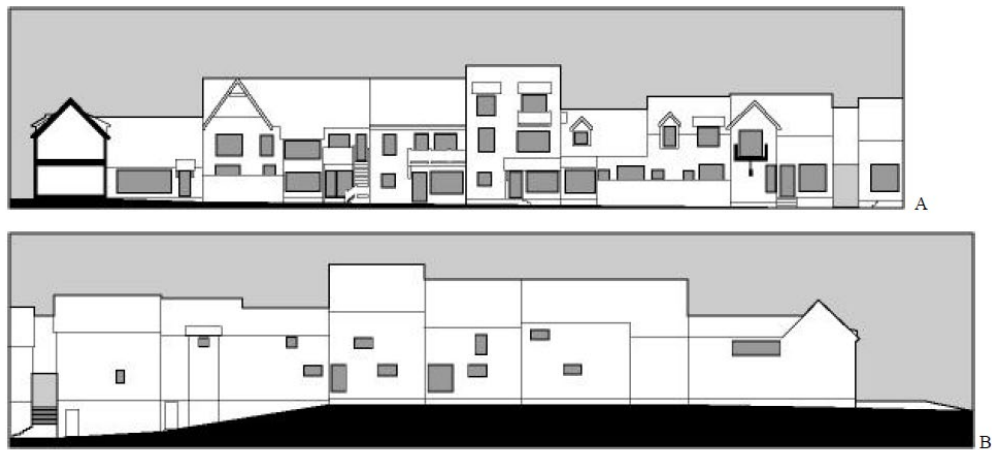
Elevation diagram of the southern row of townhomes. Image A faces towards the pedestrian street and B shows the rear side facing the parking lot (Torres-Antonini 2001, 91 *Figure 5-4*).
